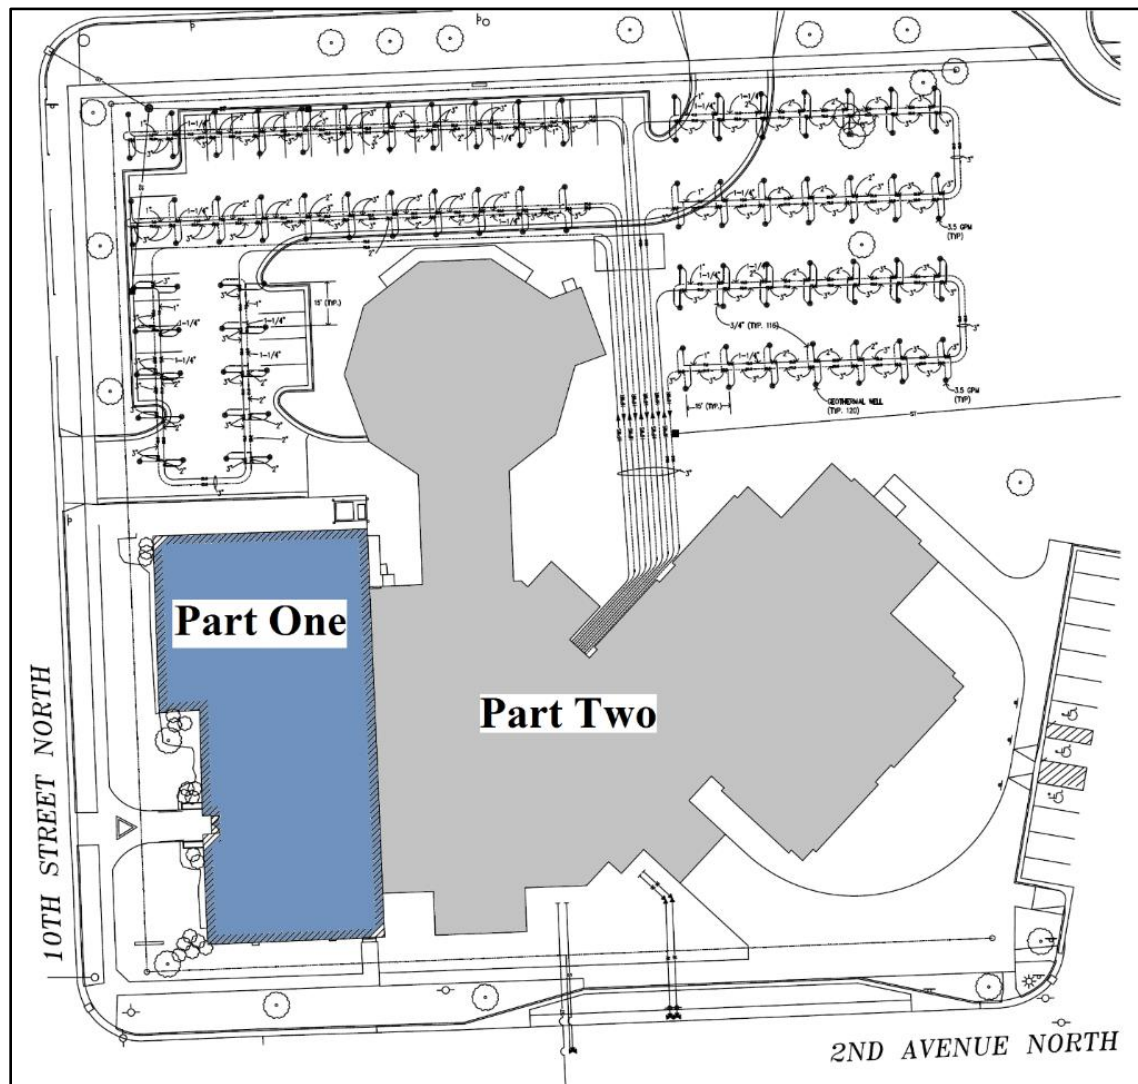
NDSU Richard H. Barry Hall building – Underground loops
